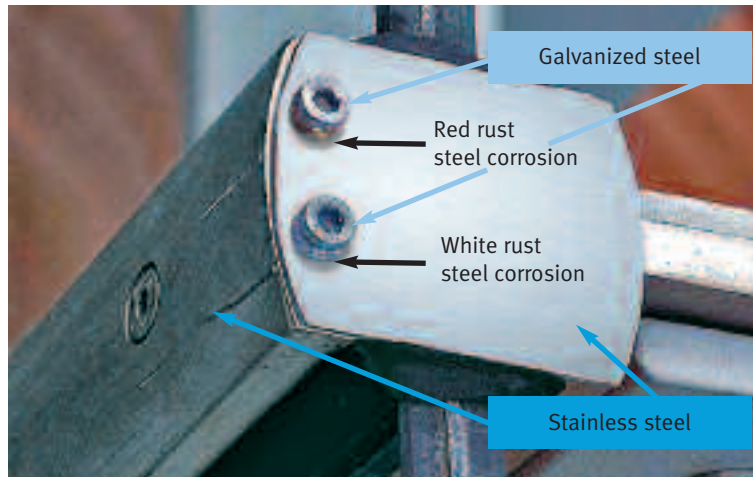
shows an example. The upper end of horizontal stainless steel sections in a steel and glass facade was covered using two galvanized screws. Starting from the crevice between the lid and the screw, these show marked white rust formation and even, to some extent, corrosion of the base material. These phenomena were observed after only about 12 months of service, which indicates that this is not a durable solution. Stainless steel fasteners should be substituted for the galvanized screws.
